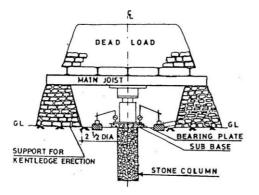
Test Arrangement for Load Test on Single Granular Pile
